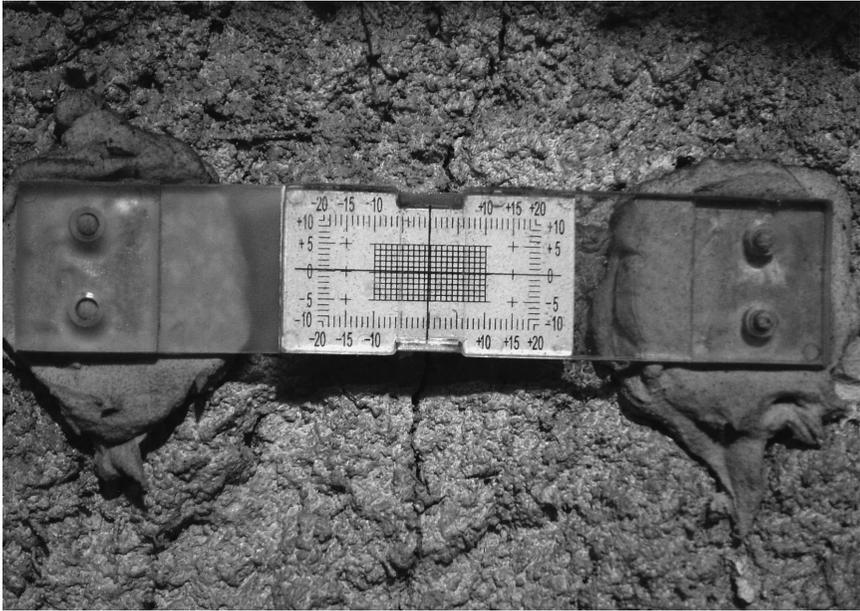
Tell Tale™ placed over a crack in a sprayed concrete lining
